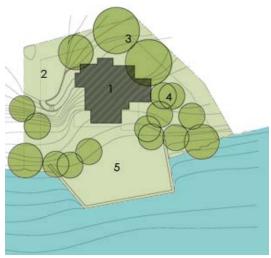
Site Plan - 1. House 2. Parking 3. Garden 4. Garden 5. Front Lawn
